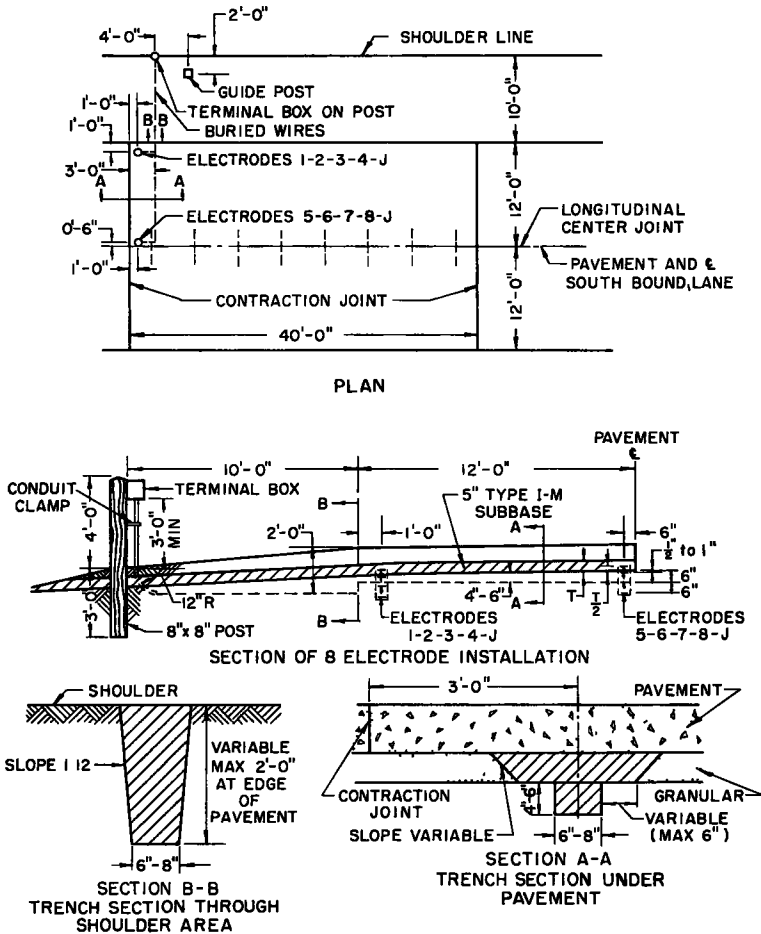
Plan of 8 unit Bouyoucos electrode installation at station 398+17.3, in 5-inch, open-graded stone (type I-M) subbase section.
